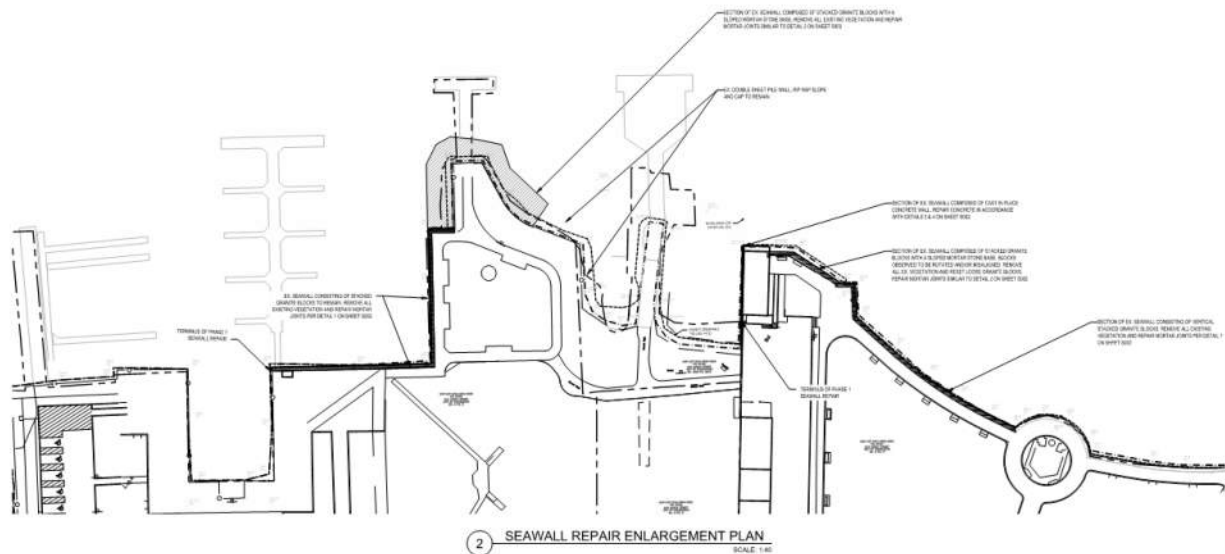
Section of Seawall Repair Plan From Plan Sheet S001
